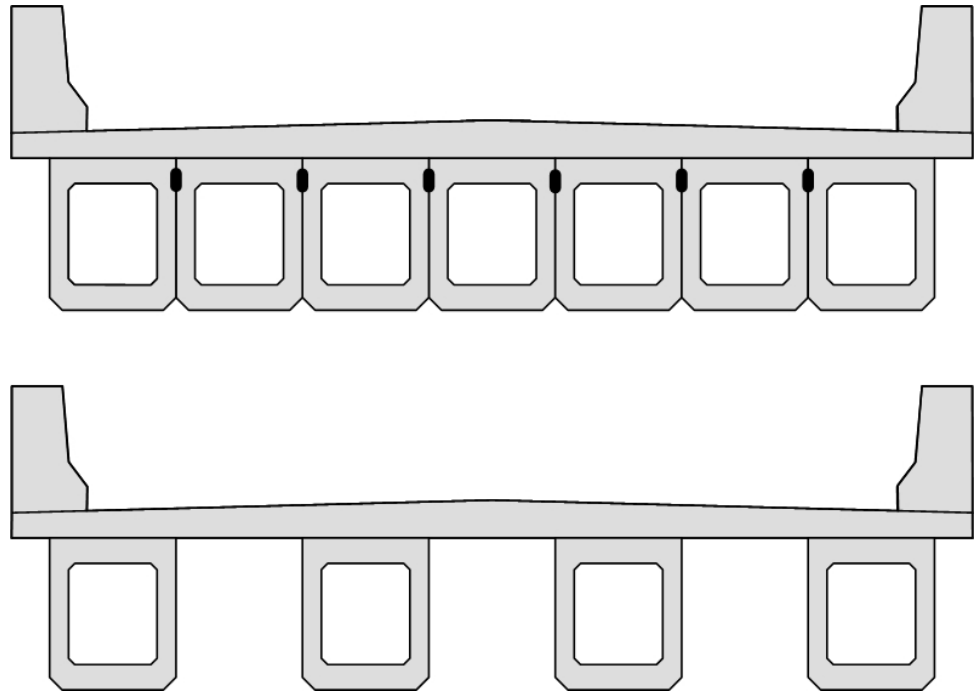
Prestressed Box Beam Cross Sections: Adjacent and Spread Box Beams
